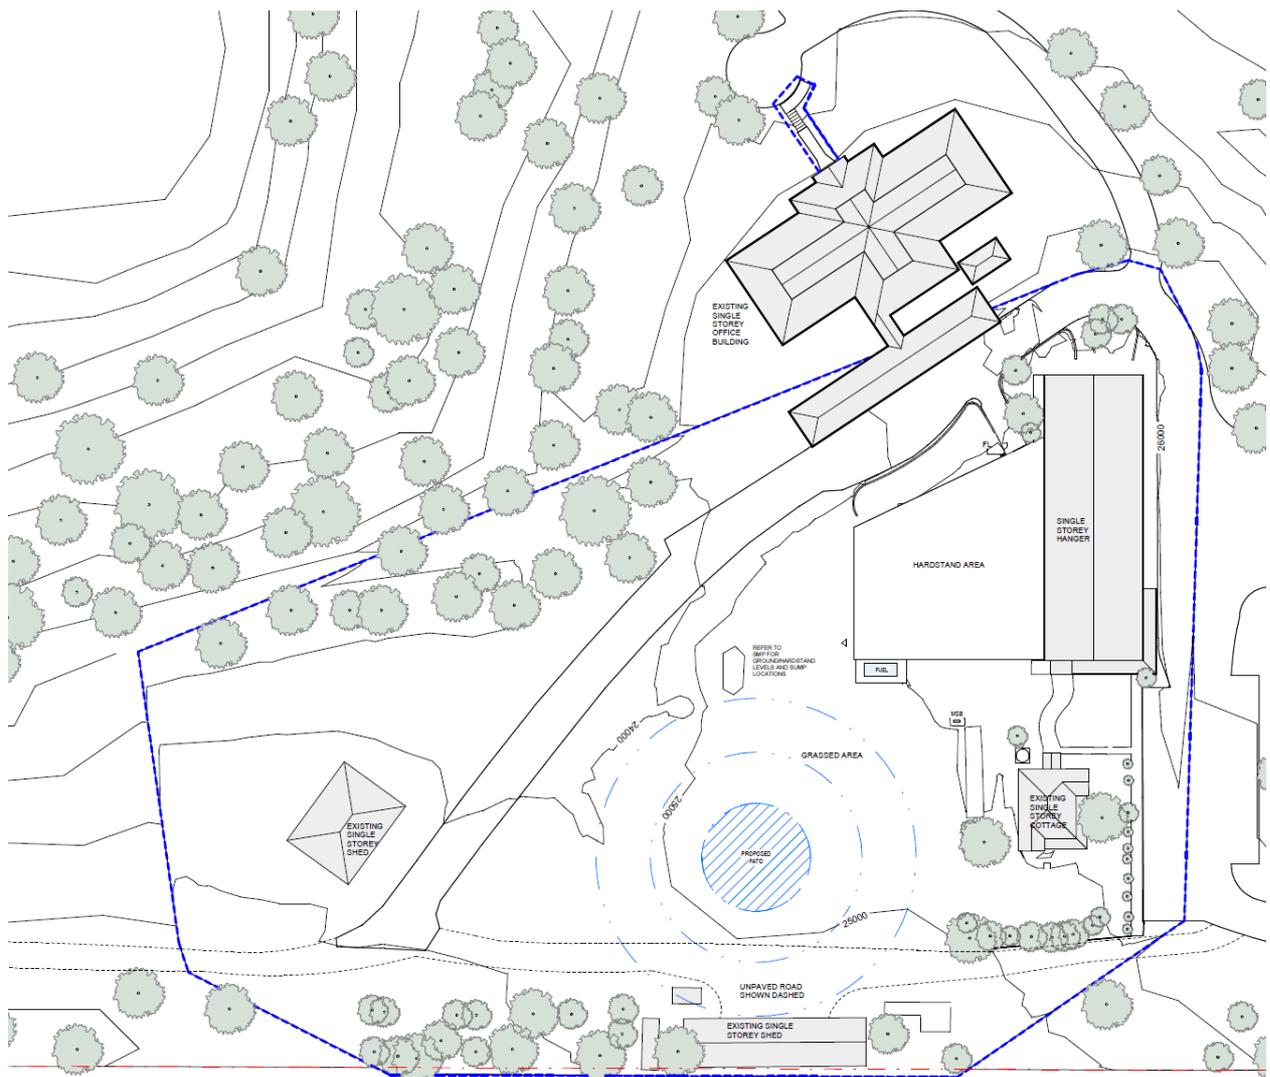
| Proposed site plan (Source: Applicant's revised architectural plans)
